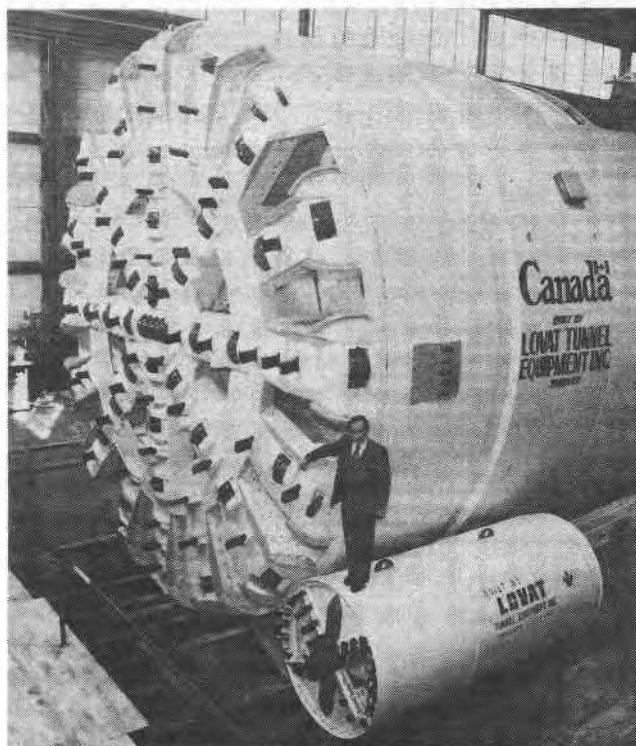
TBM – largest and smallest of the Lovat tunnel-boring machines
